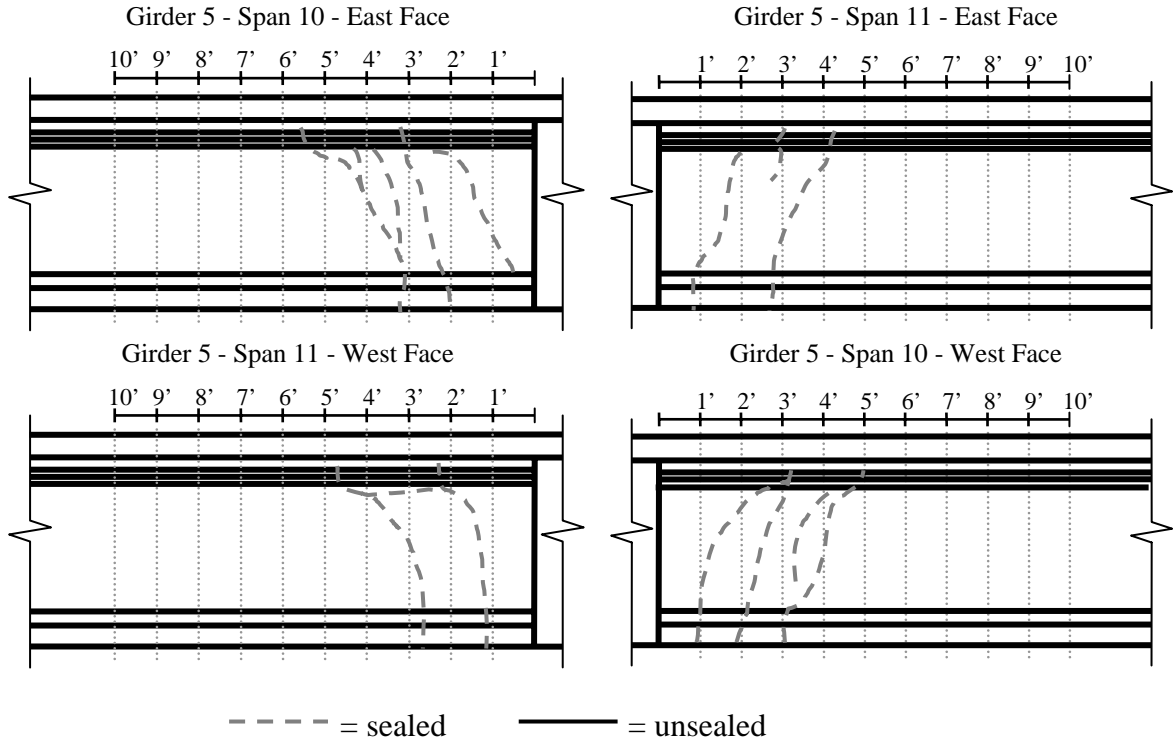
Girder Line 5 Cracking (Fason and Barnes 2004)
